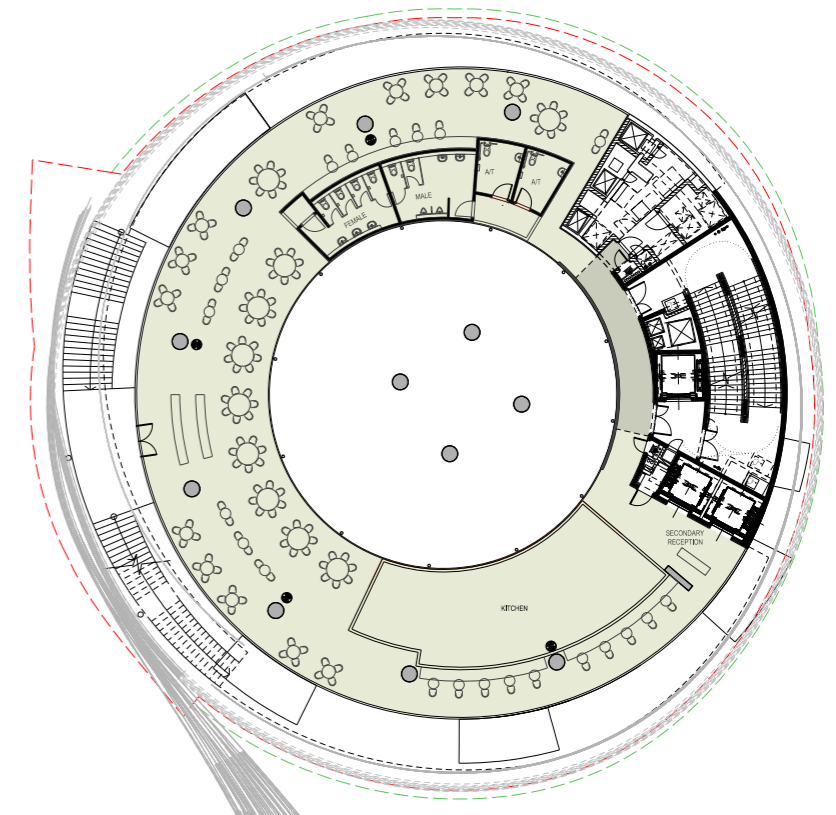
Proposed Mezzanine (with indicative fit out)
